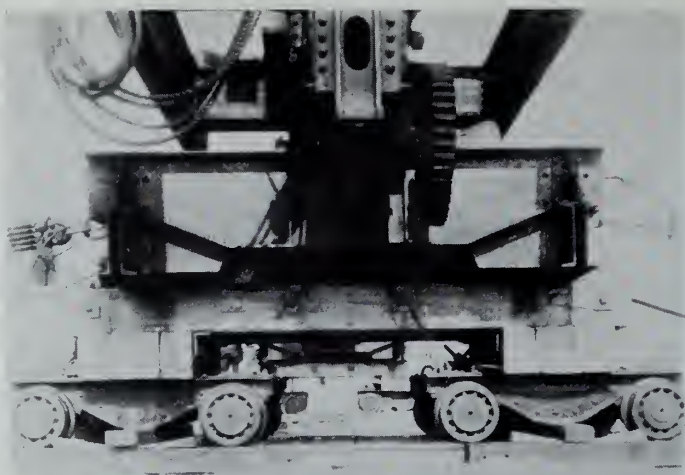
Arrangement of 60-ton trucks and timbers at shear leg corner.
